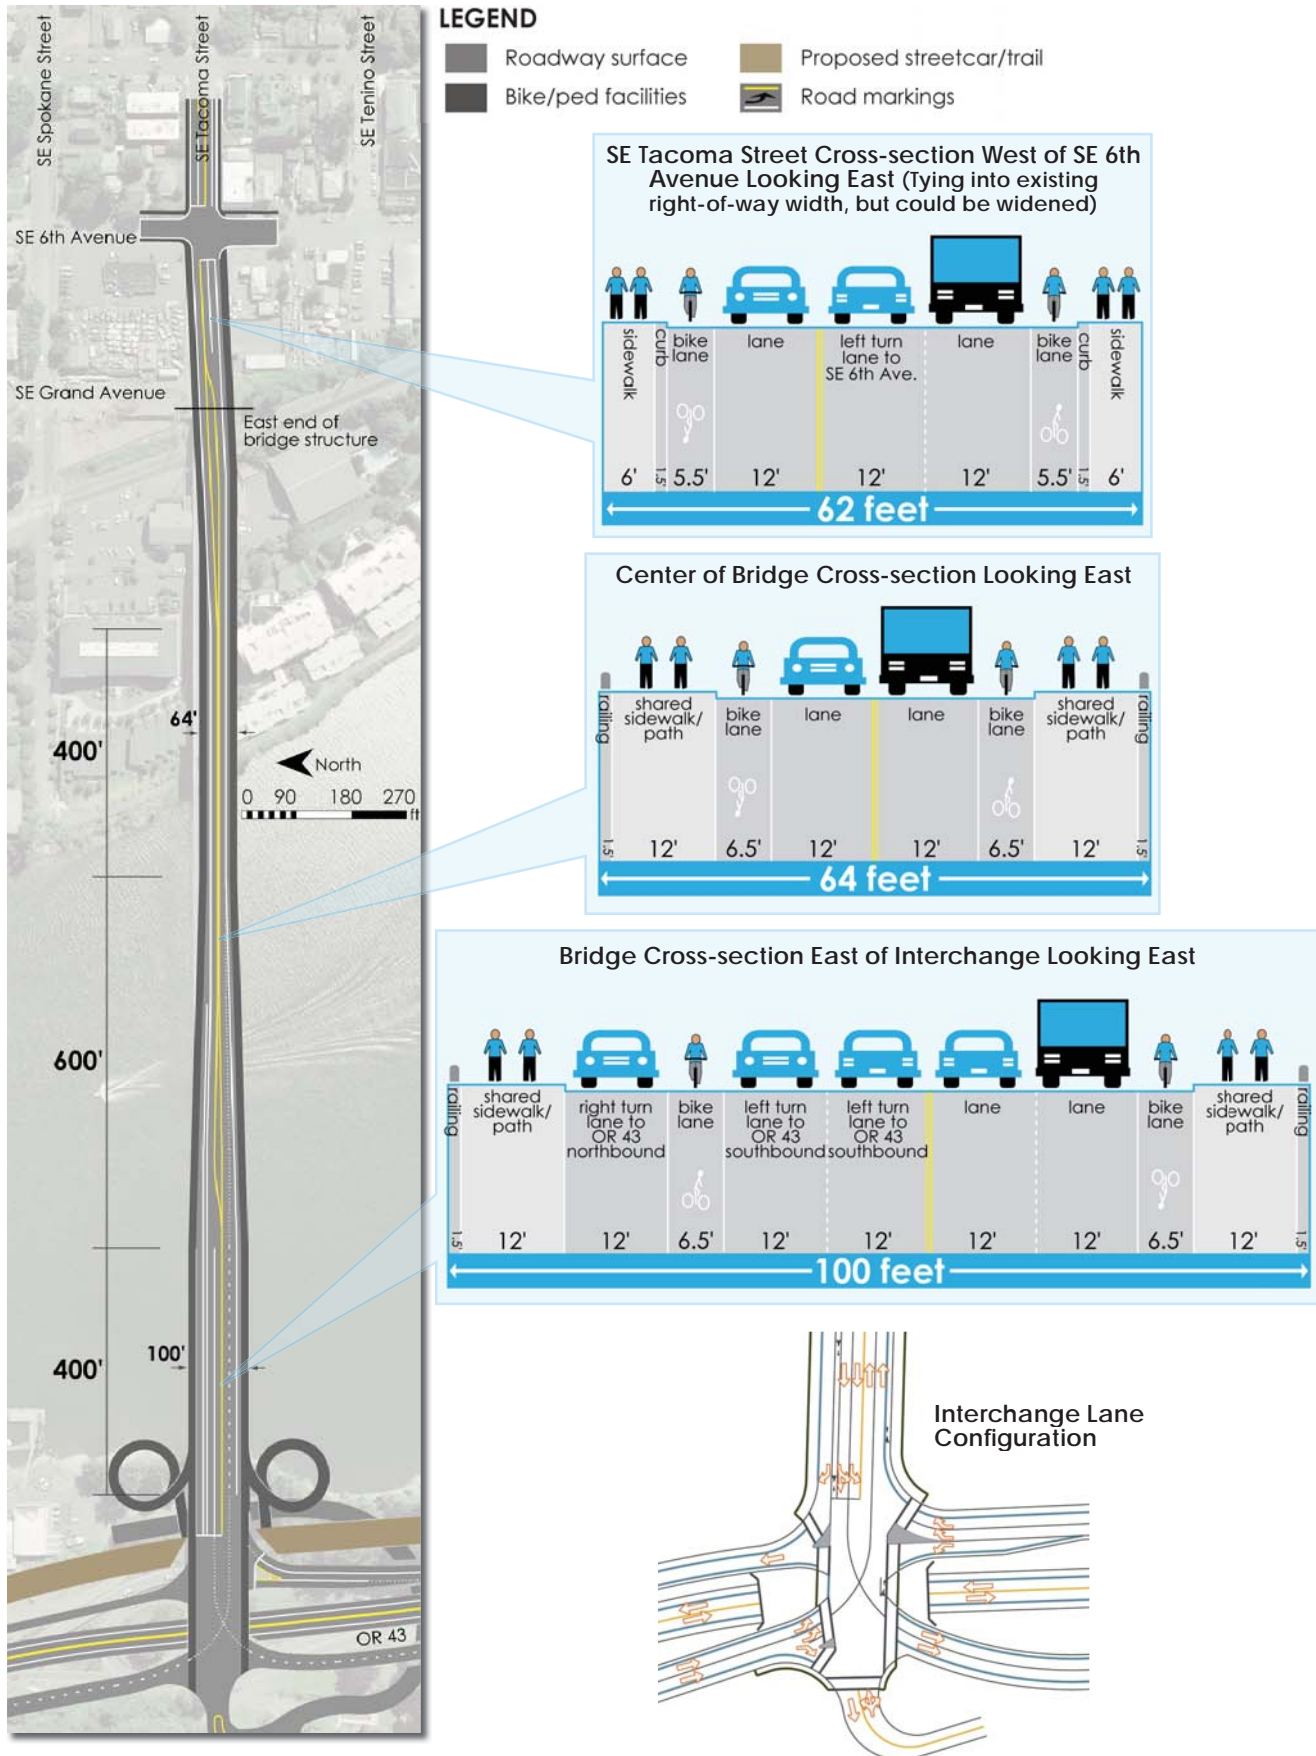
Alternative D: Replacement Bridge, Widened to the South
